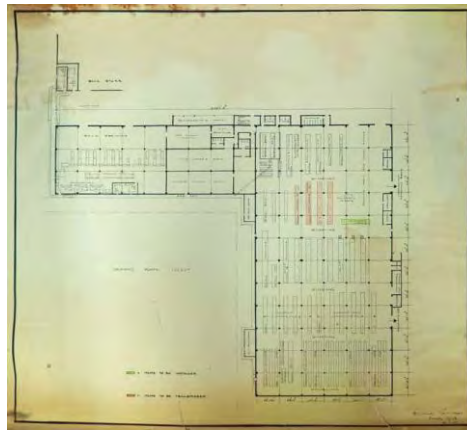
Drawing for the layout of the ground floor of the New Spinning Mill, 1972. (Source: Pacific Brands plan room)
